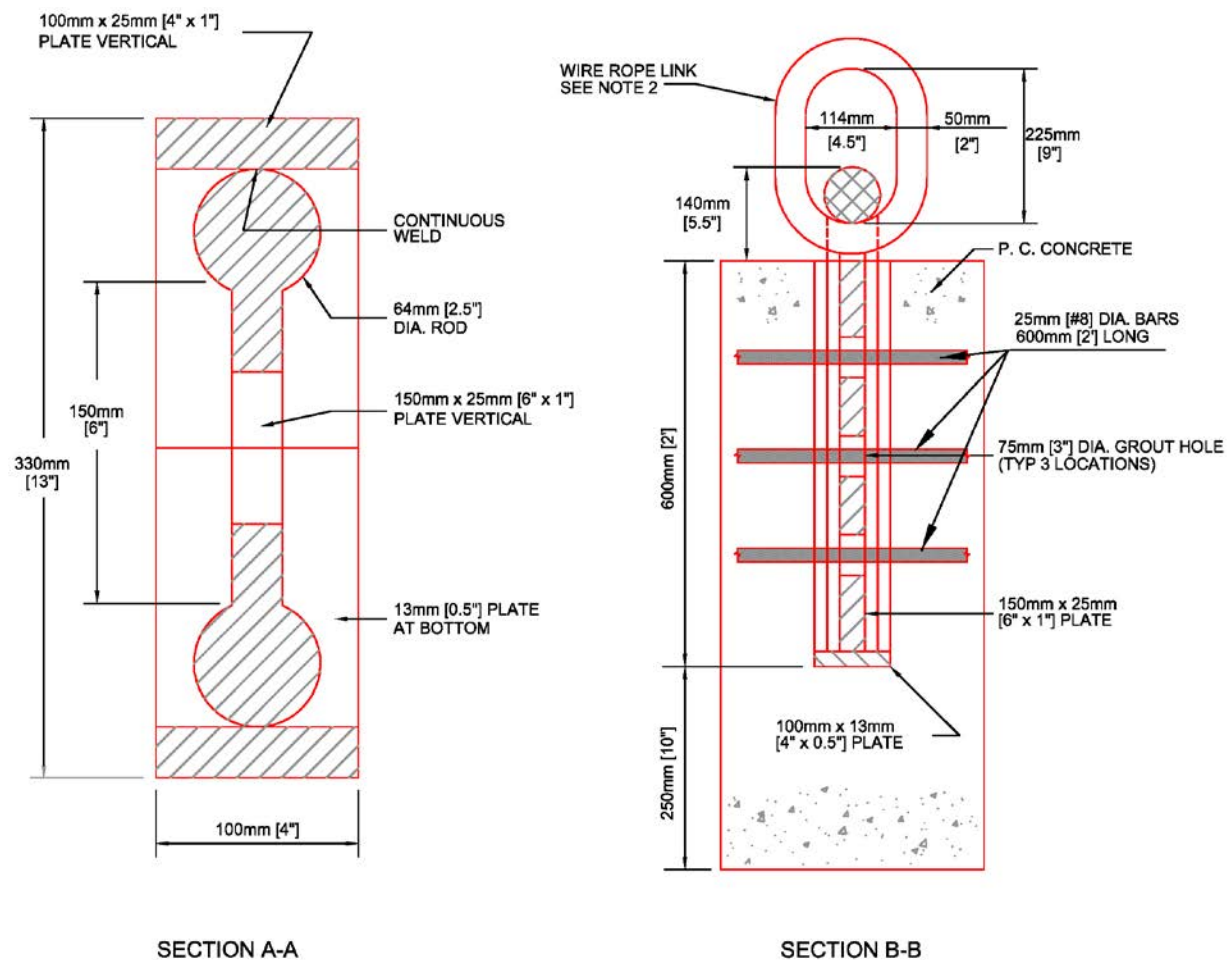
Example of 267 kN (60,000 LB) Square Aircraft Anchor Block and Cross Section
